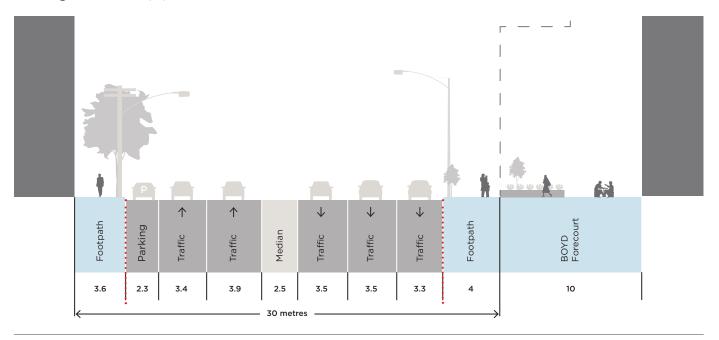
Existing conditions of City Road between Queens Bridge Street and Balston Street, looking east towards Power Street (Section A)
